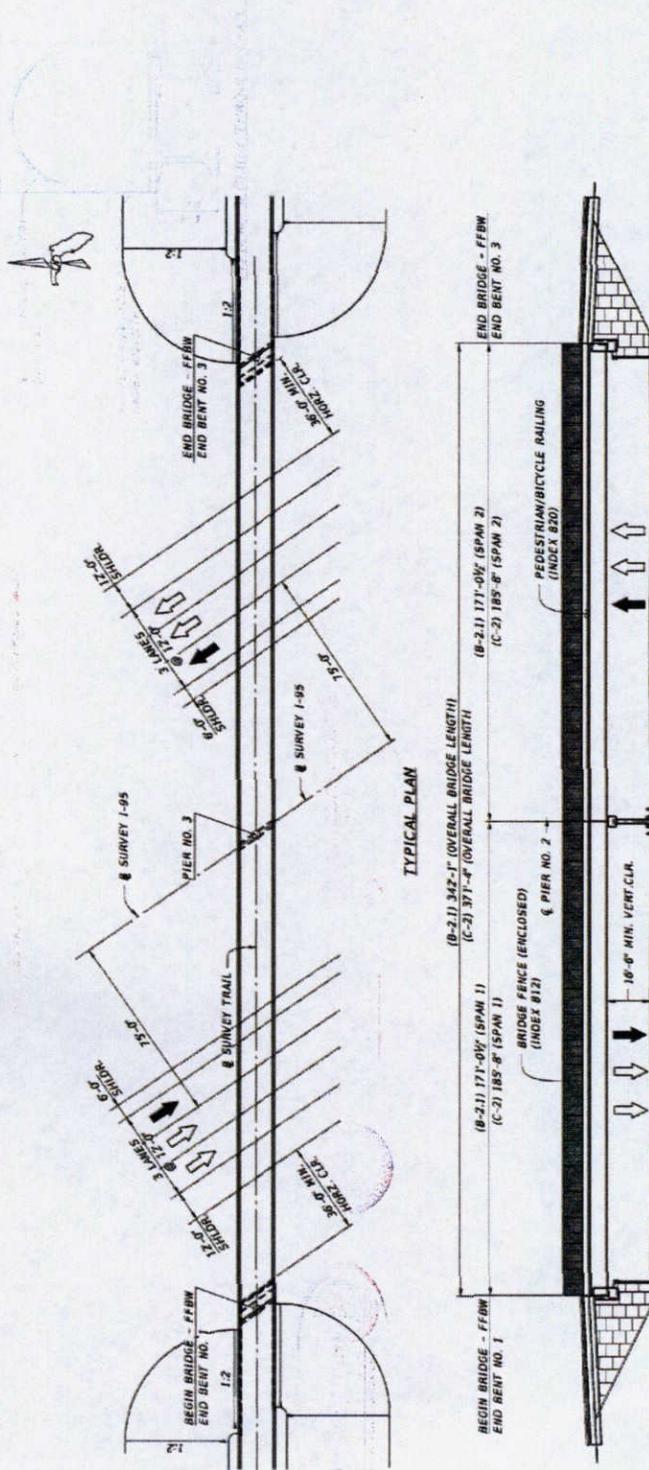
Typical Sections – Roadways & Trails – Section B-2
